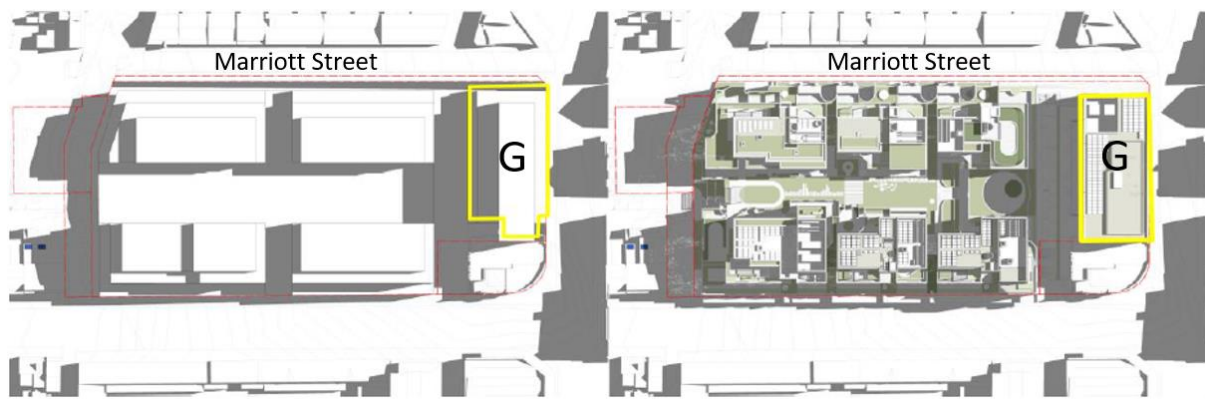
Building G DCP envelope (left) and Building G proposed (right) at 12 midday, winter solstice.
